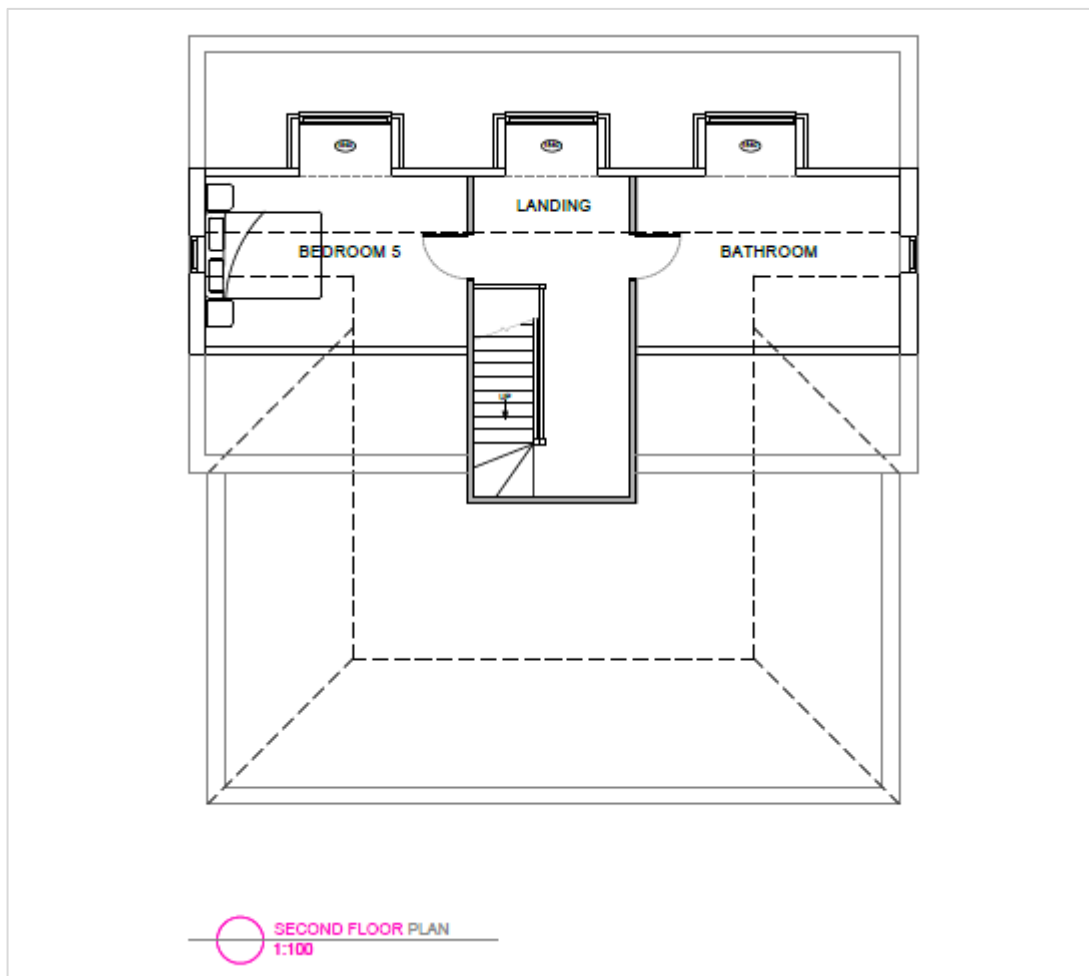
PROPOSED SECOND FLOOR PLAN (DRAWING NO. BDS-DB-P02)
